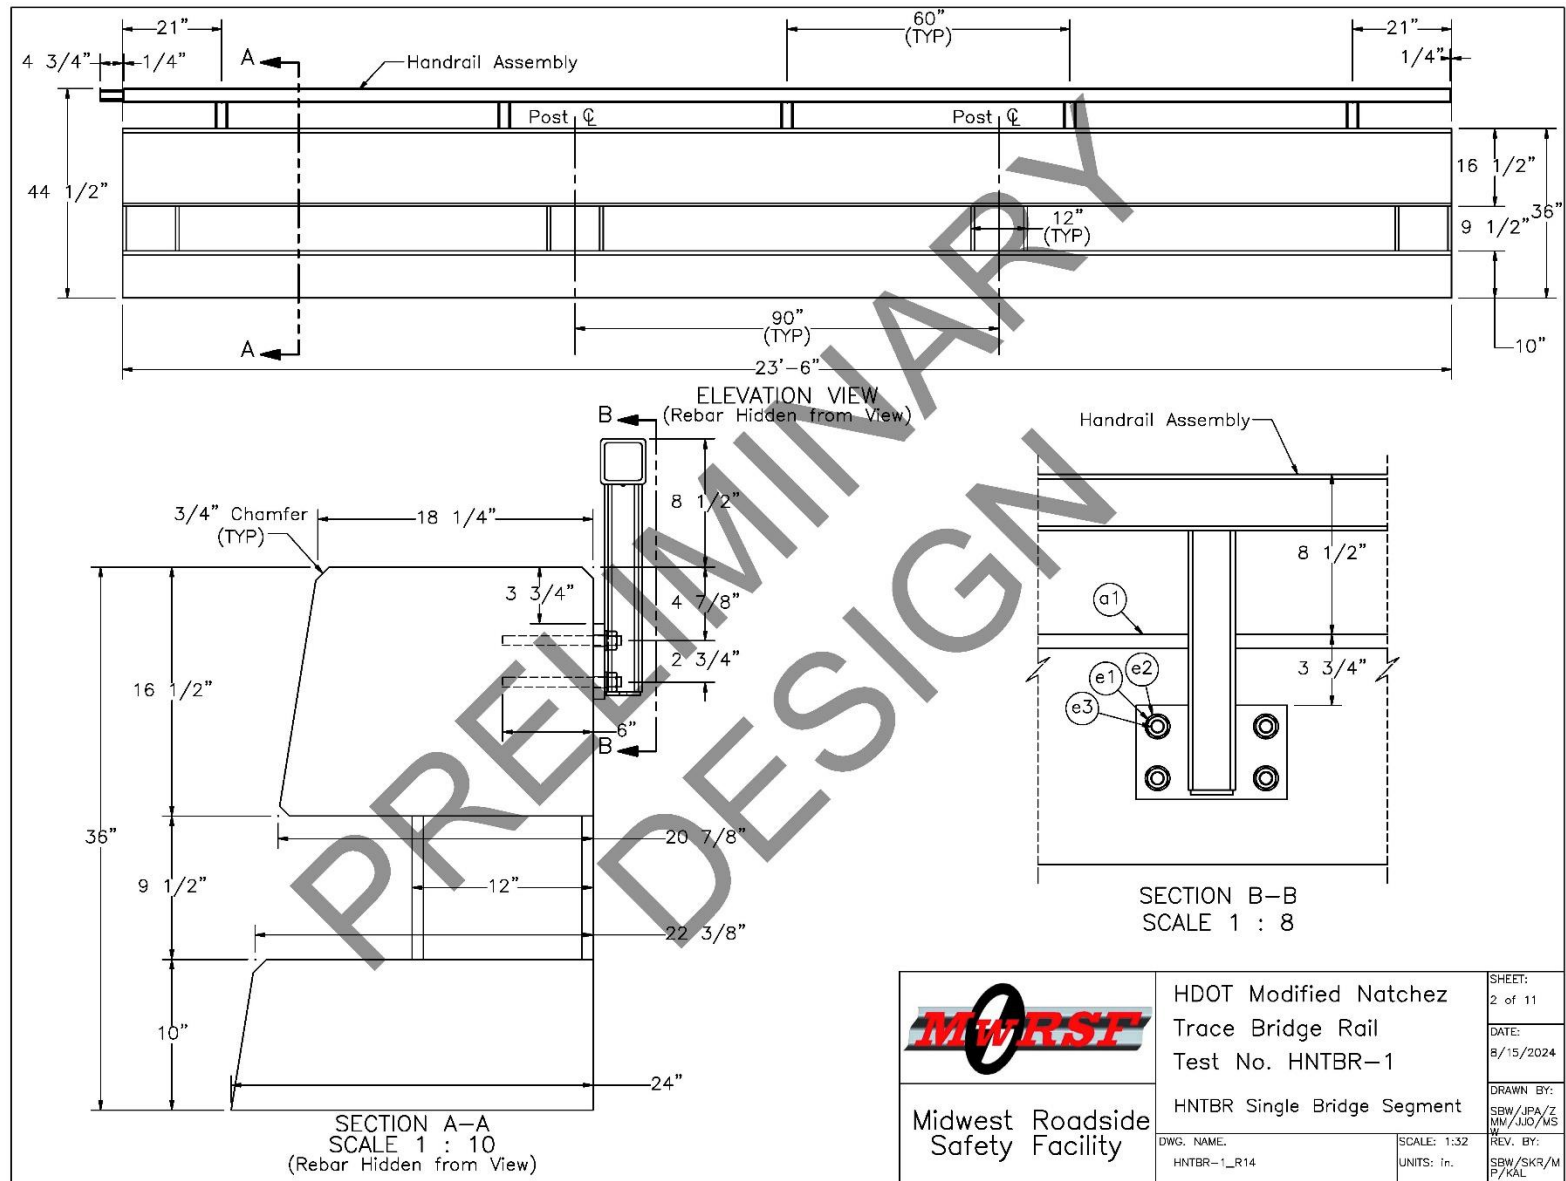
Bridge Rail Layout, Test No. HNTBR-1
